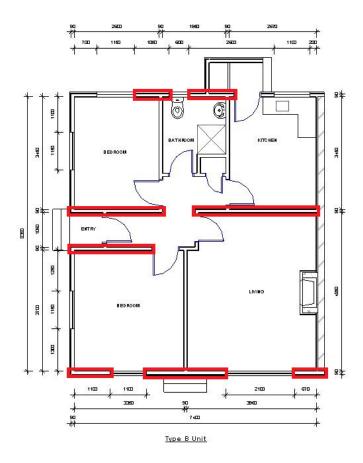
Walls used for bracing in the longitudinal direction Type B.
